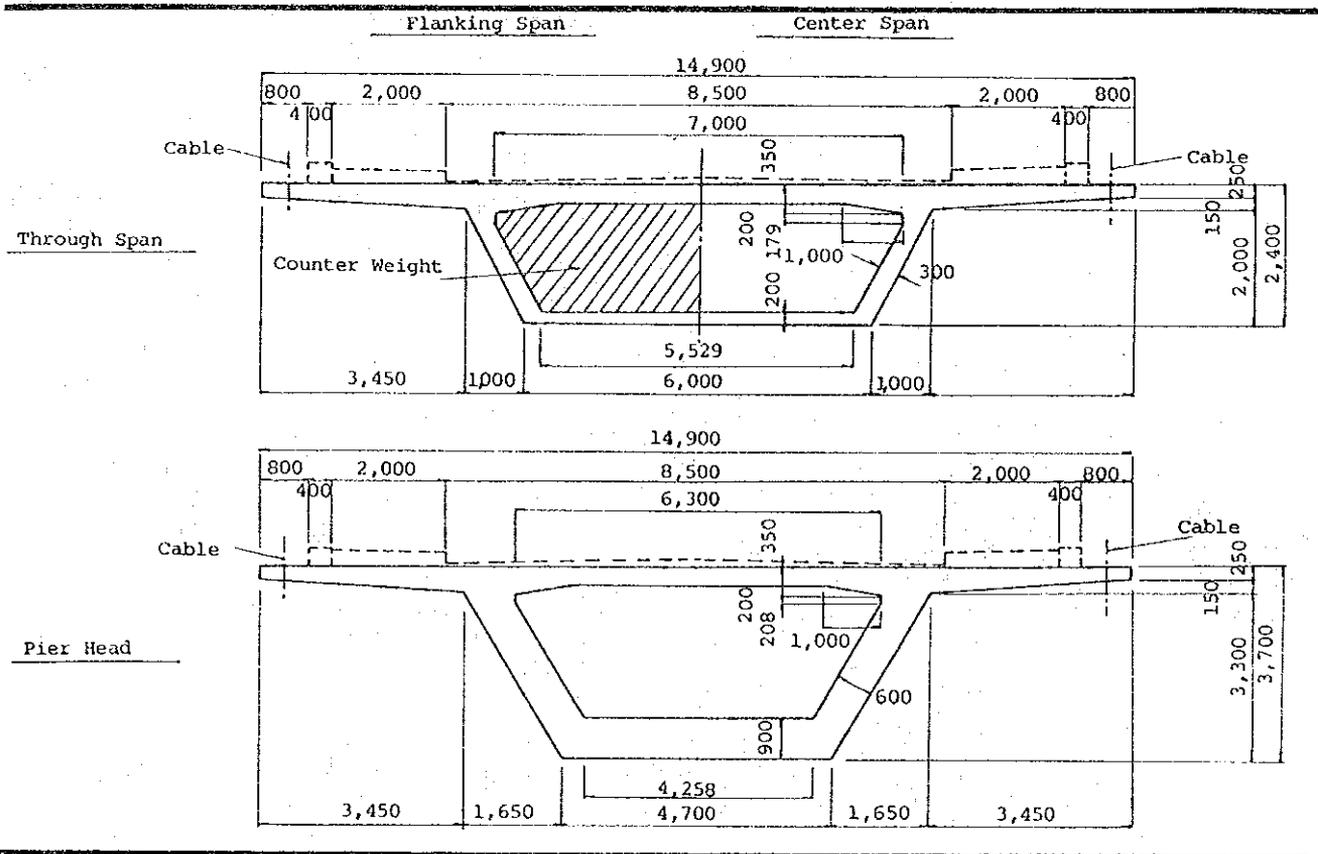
CROSS-SECTION OF MAIN GIRDER
